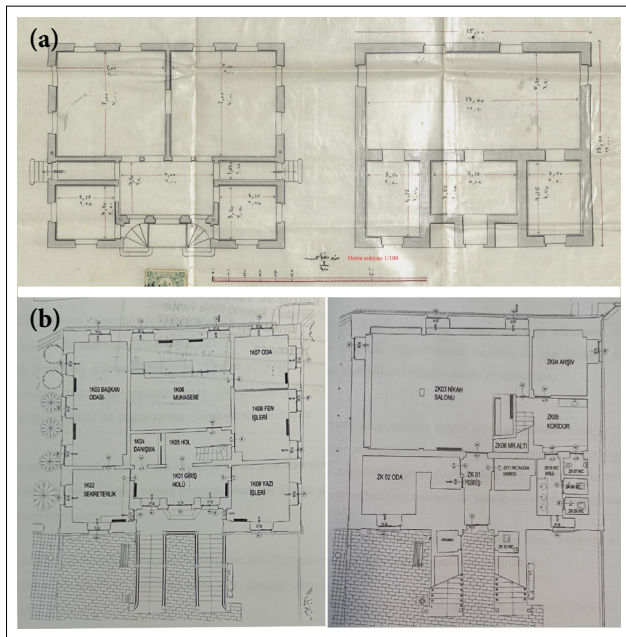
(a) Karacaköy Greek School original plan drawing (I.AZN. 71/43); (b) Floor plans before and after the restoration (Detay Architecture, 2013, Conservation Council Archive).
